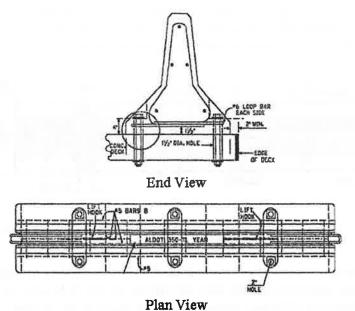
Anchor reinforcement – Alabama DOT Source: Alabama DOT PNJB-629 sheet 3
